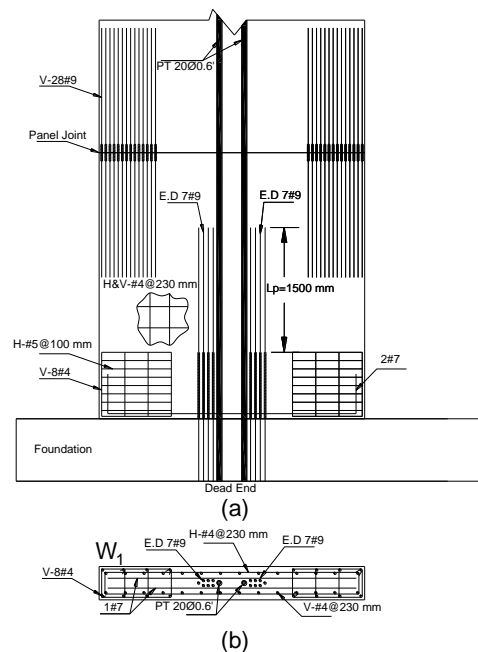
Reinforcement layout of W_1 rocking wall: (a) elevation, (b) plan view.
